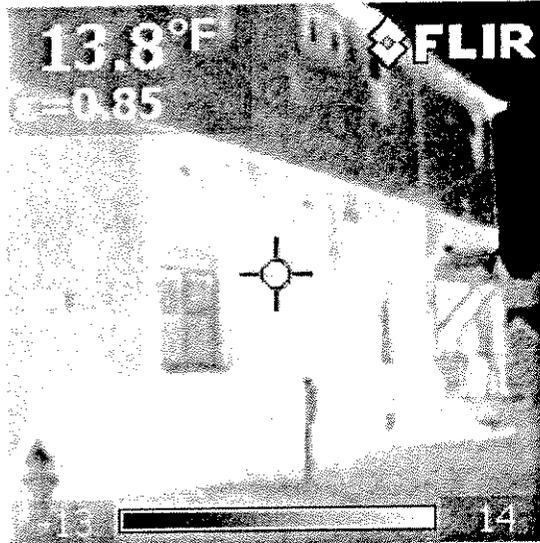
York Village Fire: Block wall leaks heat much more than frame wall.
